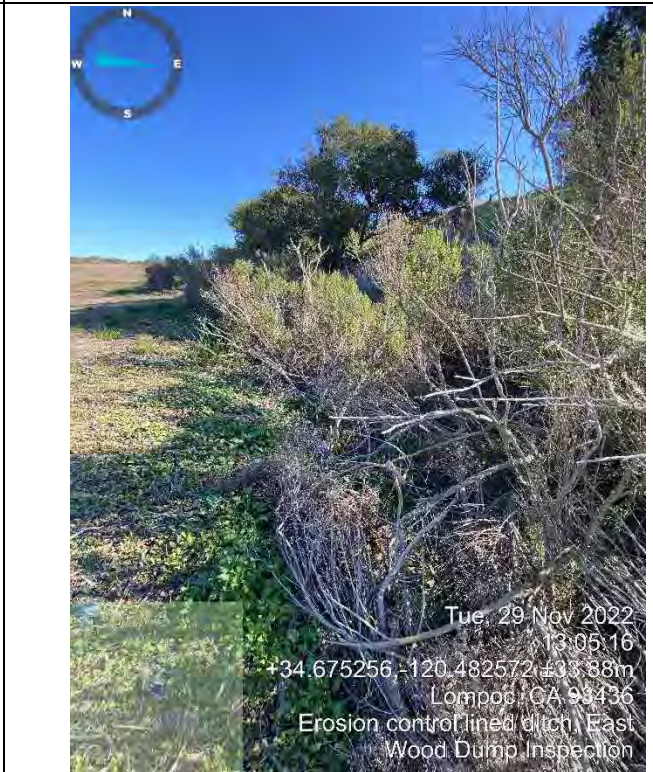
Eastern Erosion Control Lined Ditch - southern portion of the ditch is overgrown with woody vegetation (facing east)
